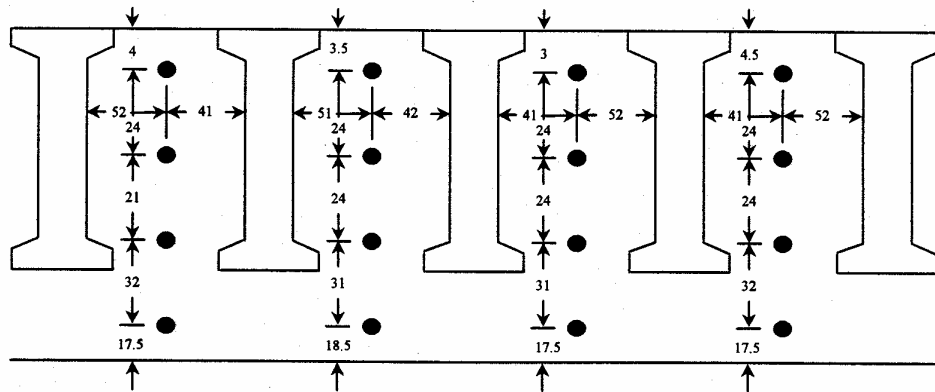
b. White River Bridge south abutment gap measurement hole locations in relation to the abutment and bridge beams
